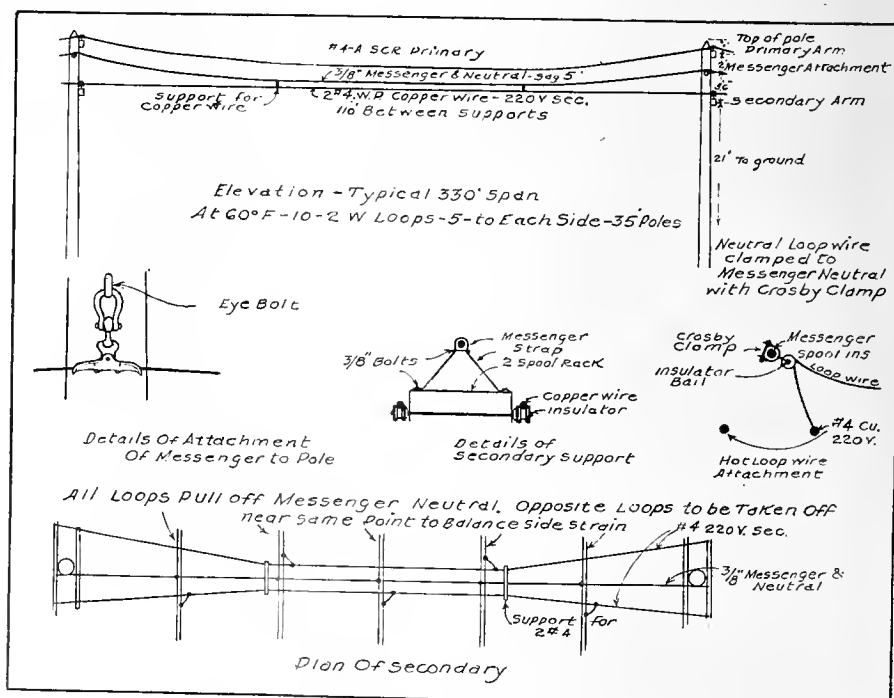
Plan (below) and elevation (above) of a single 330-ft. secondary span showing scheme of construction and showing also (center) certain details.
